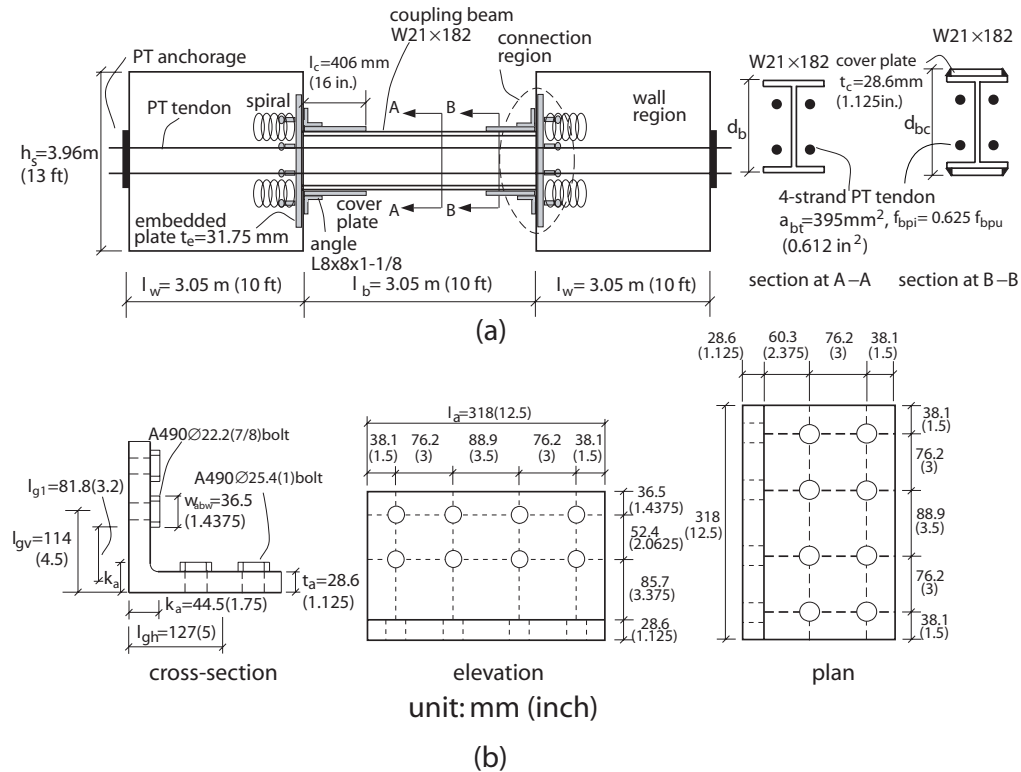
Floor level details: (a) elevation; (b) top and seat angle connections
